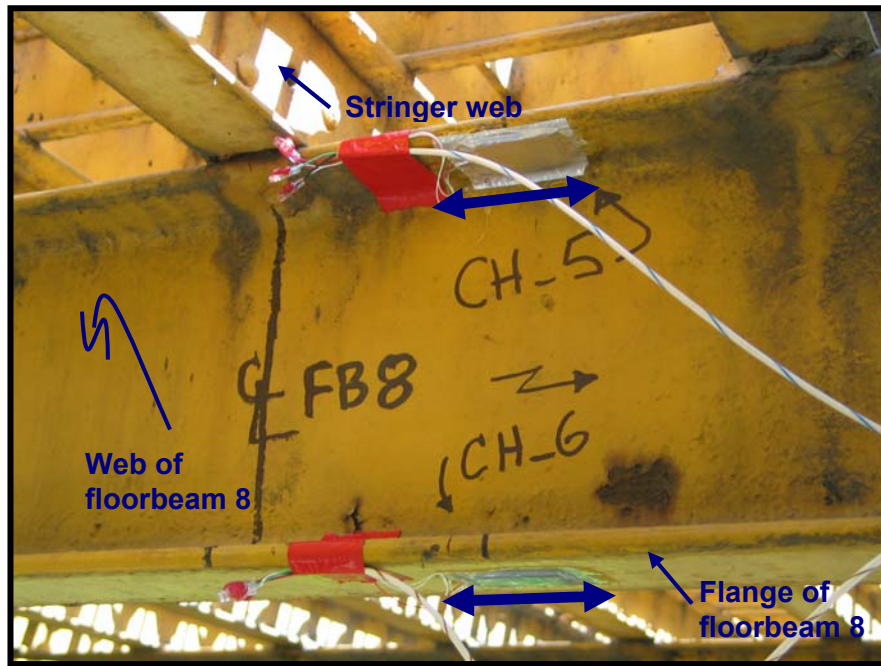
CH\_5 installed at mid span of floorbeam 8 on the bottom face of the top flange of the floorbeam and CH\_6 installed at mid span of the same floorbeam on the bottom face of the bottom flange.
